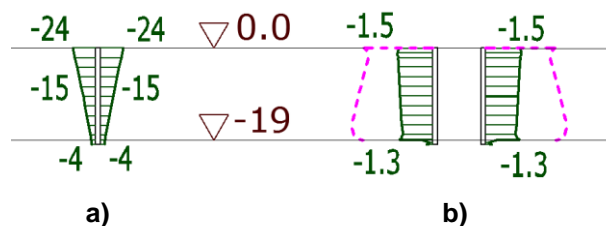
Wall SSS in alternative IIC-1 for the moment of the dam construction completion. Legend see at Figure 10
